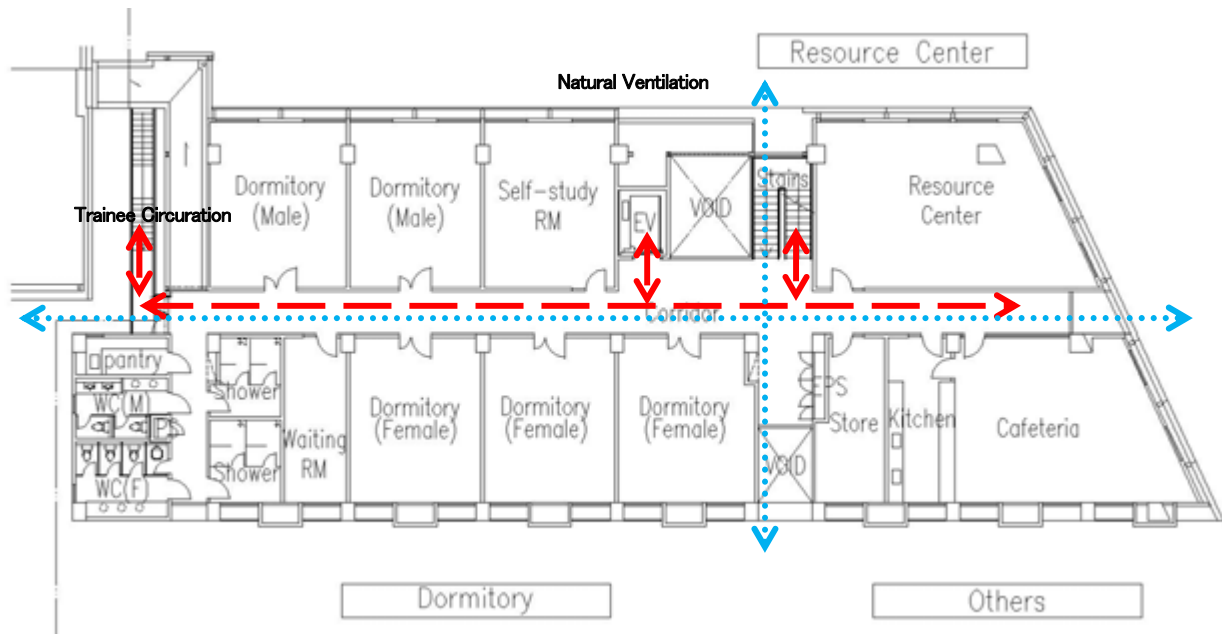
Training Center 3<sup>rd</sup> Floor Plan
